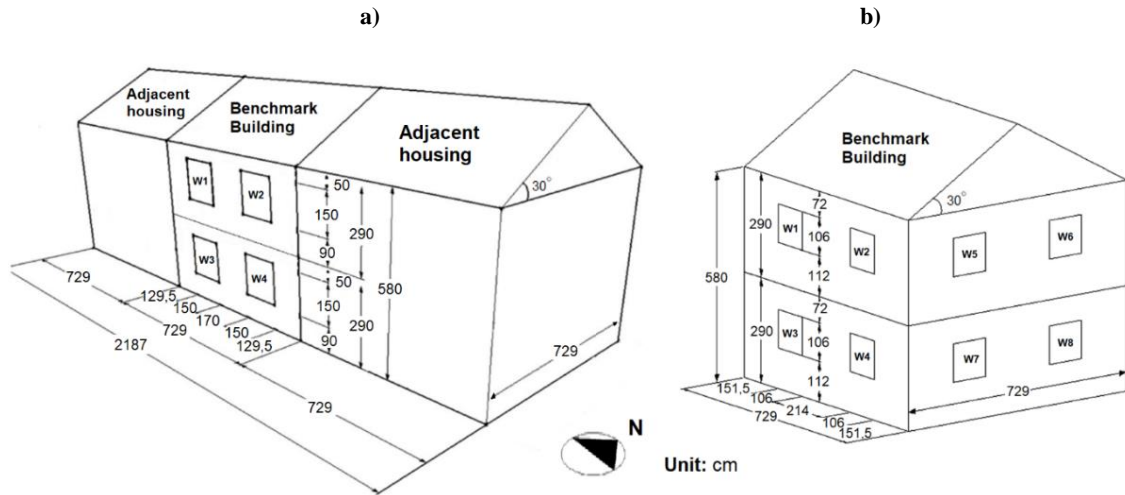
Benchmark buildings (a) terraced house (b) detached house
